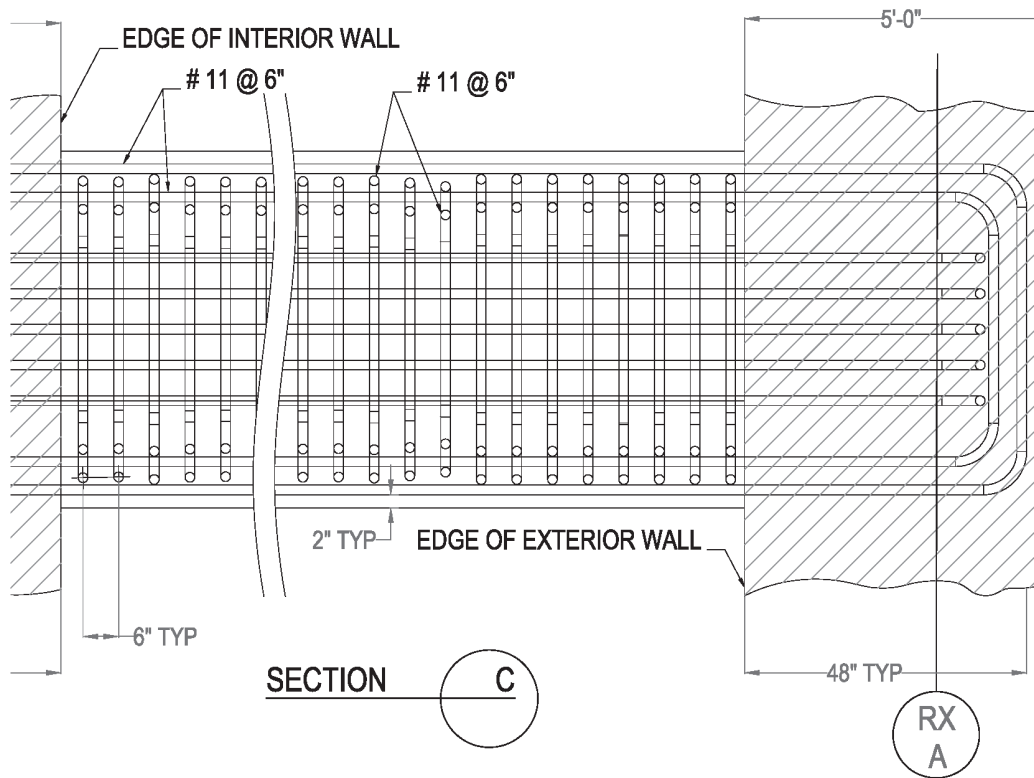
Stiffener Wall Horizontal Reinforcement Anchorage into Adjacent Walls
